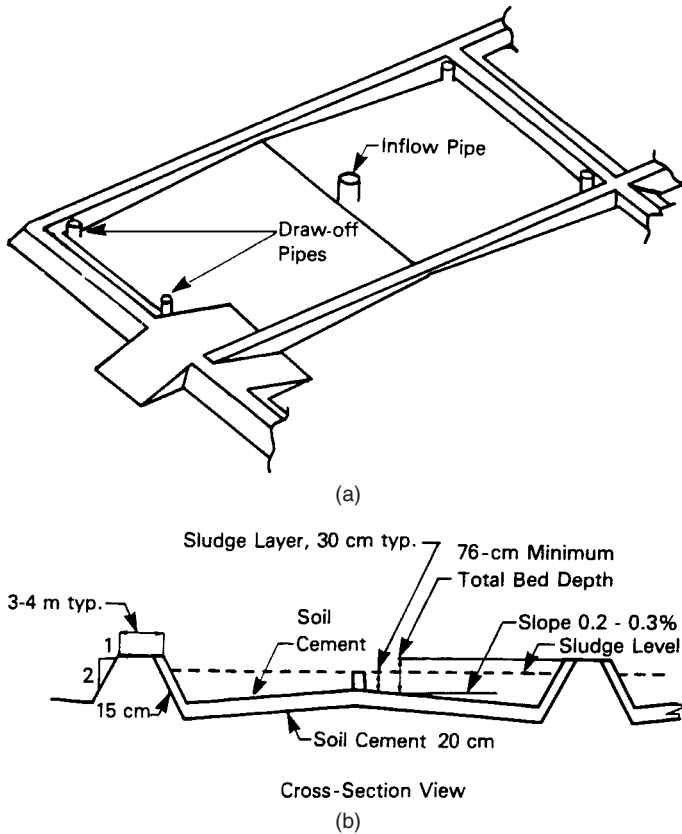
Schematic diagram of a paved drying bed designed for decanting and enhanced evaporation: (a) plan view; (b) side view.
